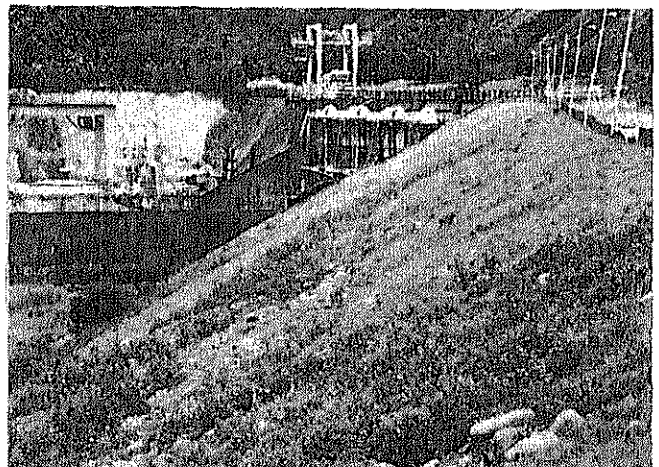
Conditions of the downstream slope-face of the Masiway Dam
